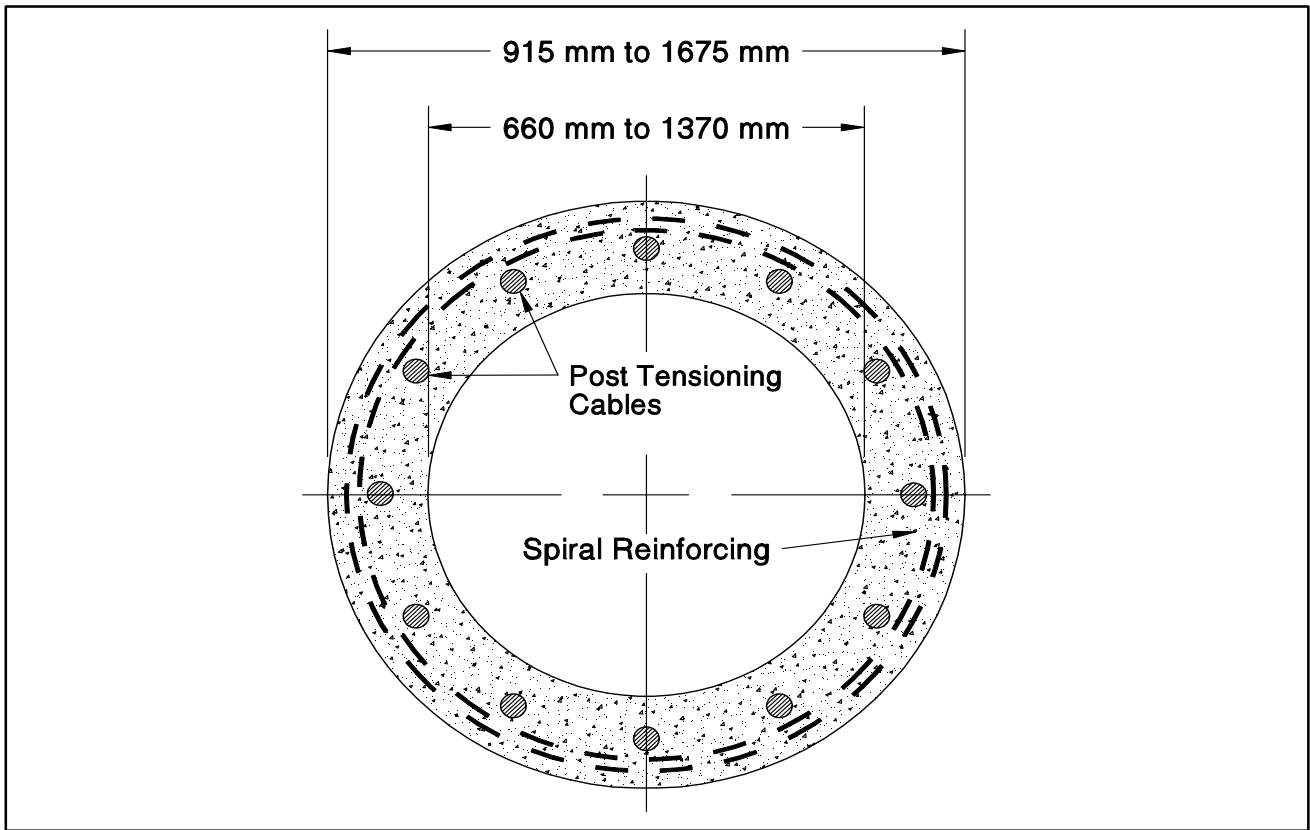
Typical Spun-Cast Concrete Cylinder Pile Section
